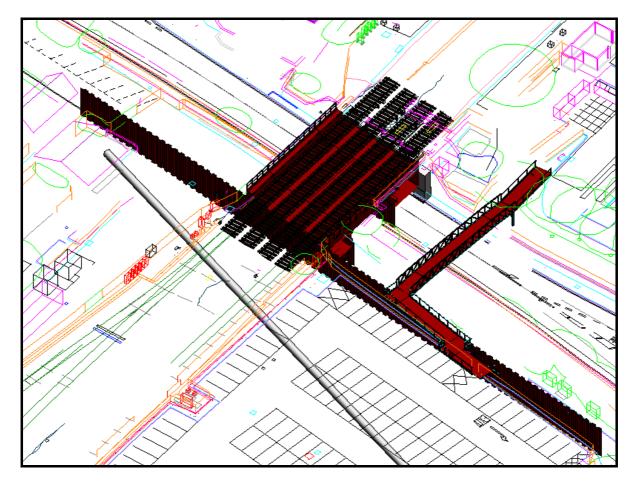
3D model extract at Botley Road, Proposed Main Span Installed
